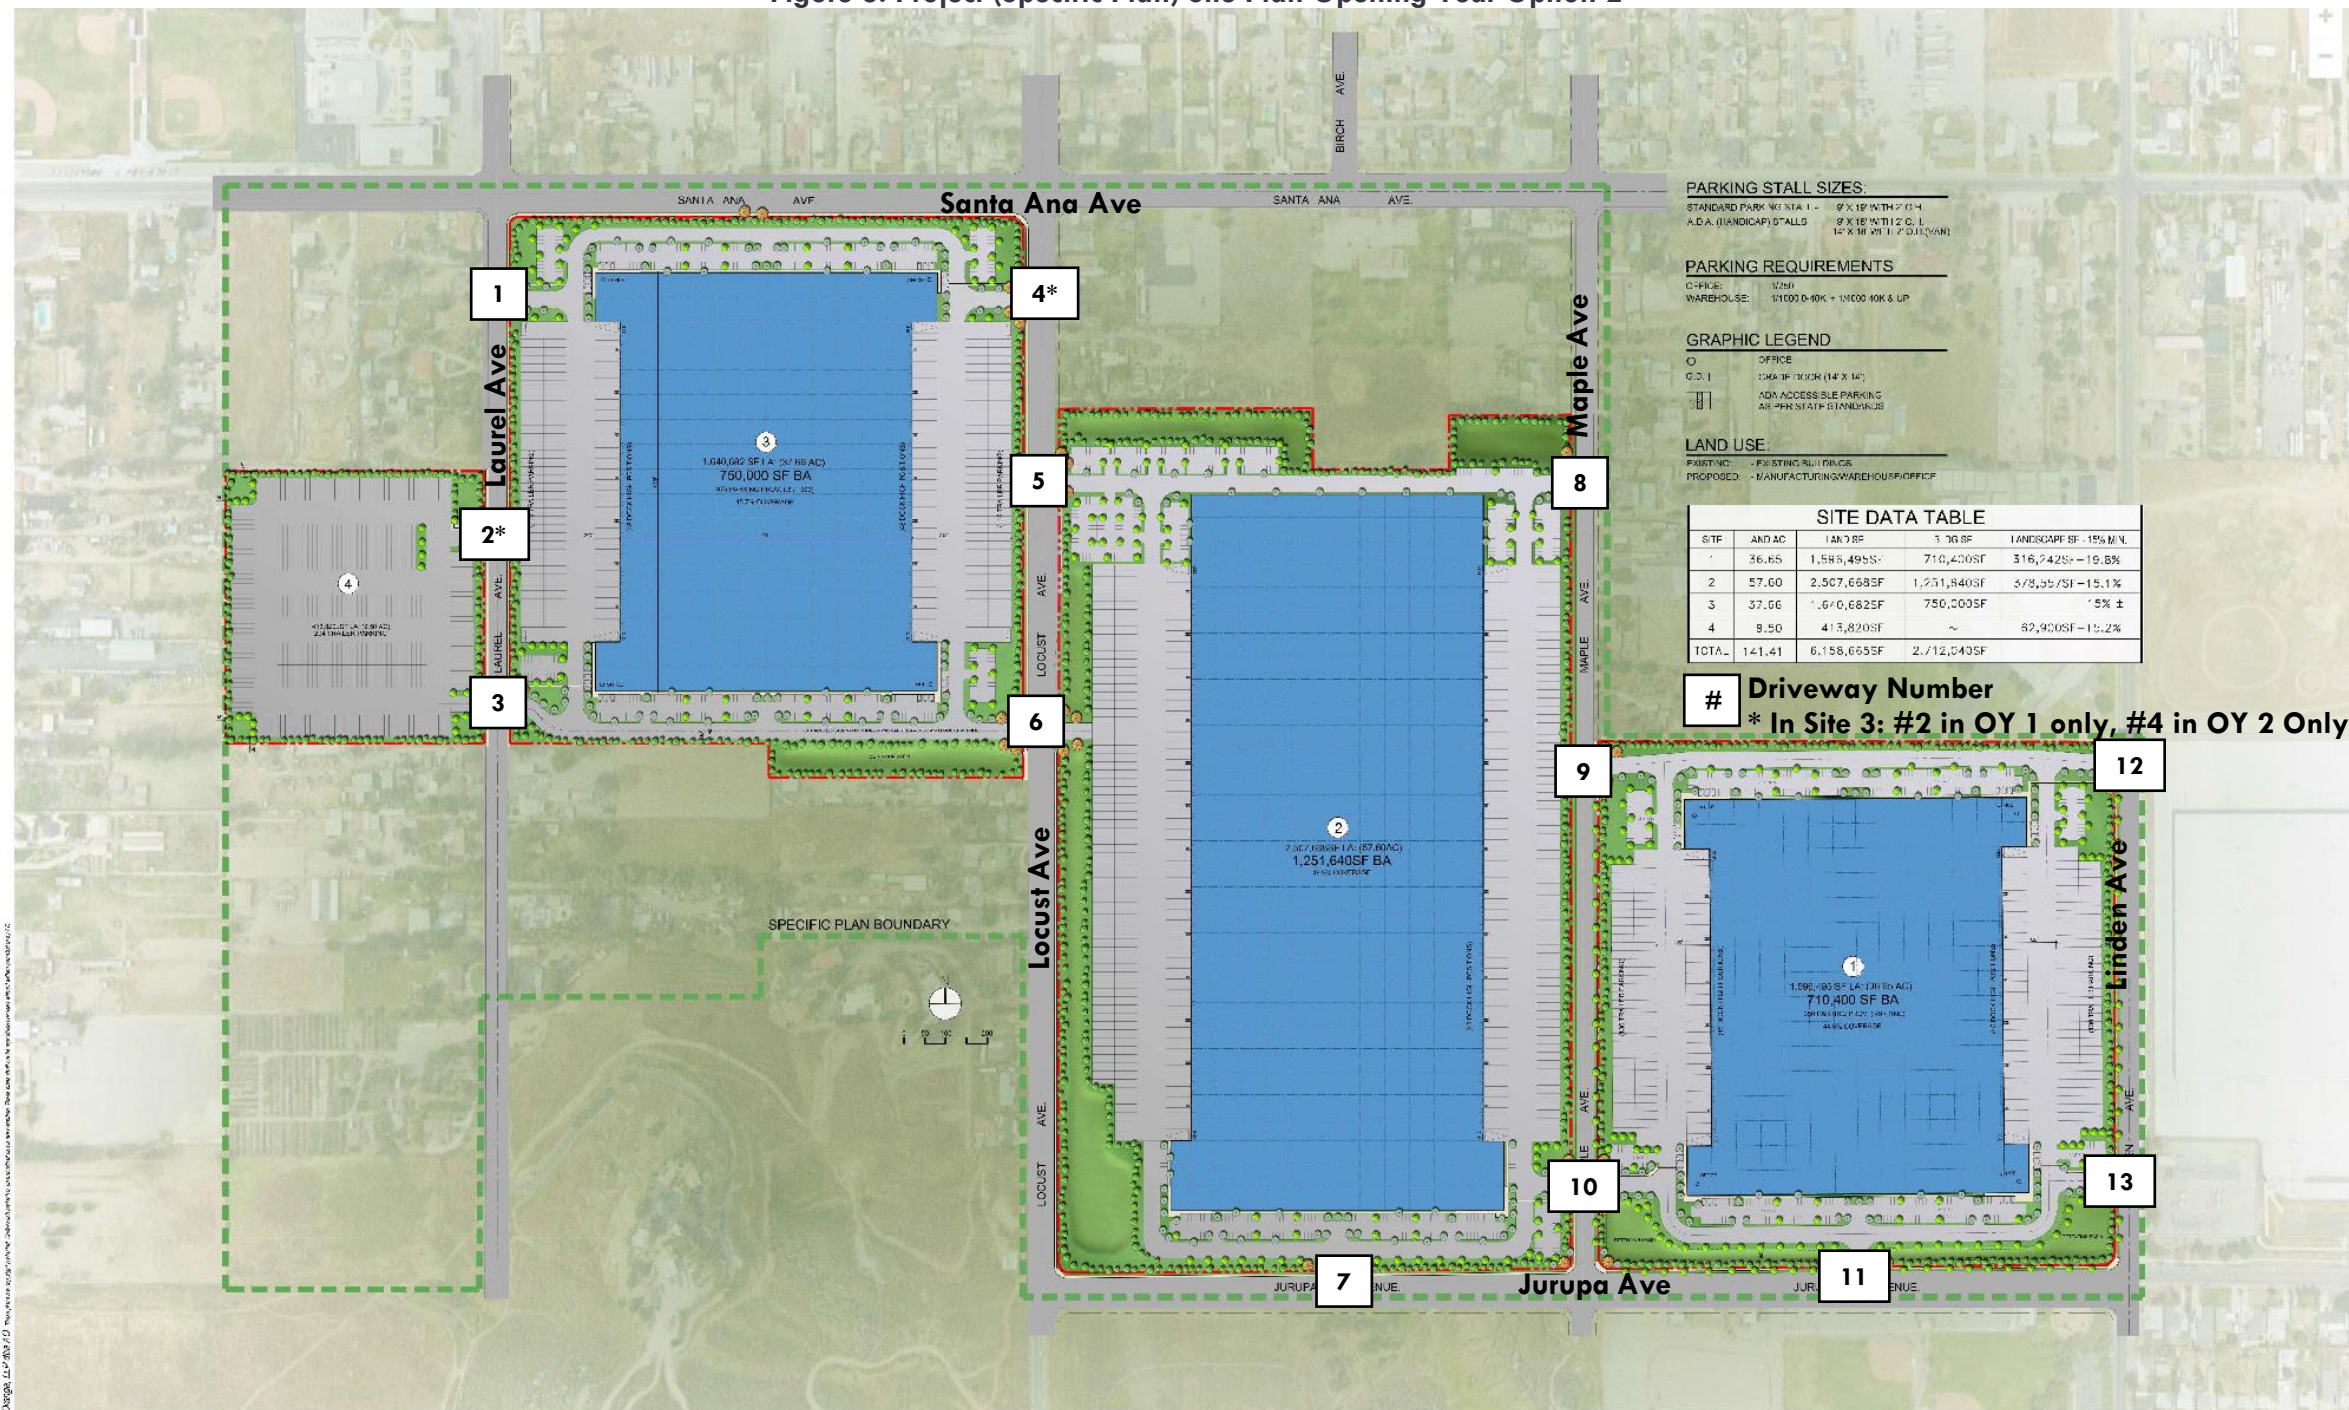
Project (Specific Plan) Site Plan Opening Year Option 1
